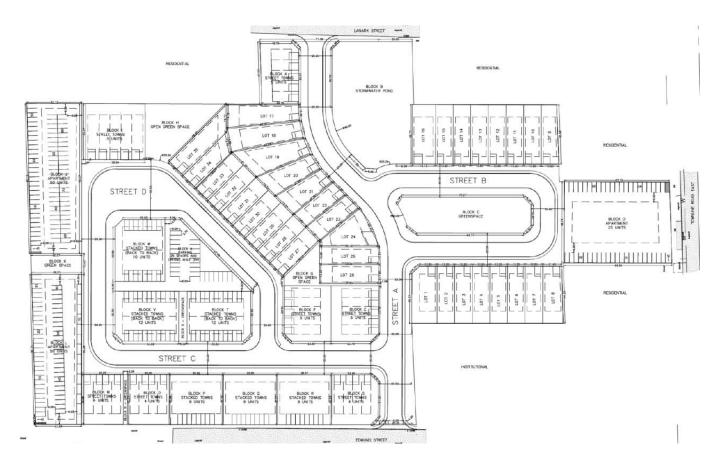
Previous Draft Plan of Subdivision Layout (First Submission)
